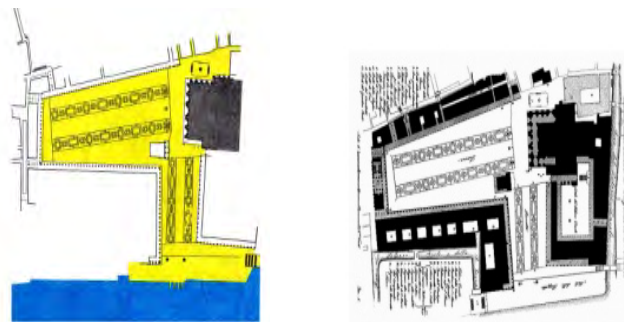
Pavement plan designed by Tirali at 1723 (Trancik, 1986)
